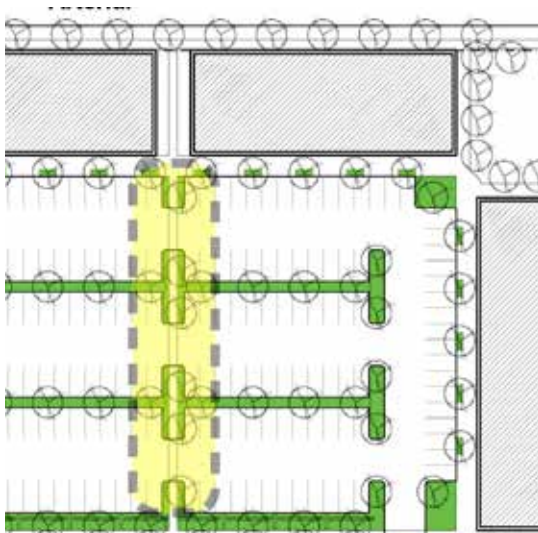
S5: Site diagram illustrating a parking area walkway perpendicular to the parking drive aisles. The walkway is present when the parking area includes at least three parking modules parallel to the building.
